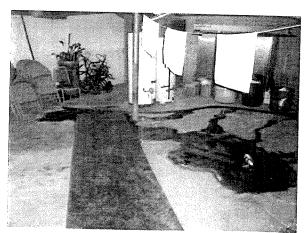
Basement inside the clubhouse (with a typical floor drain)
